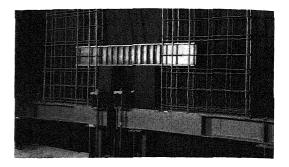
Overall view of reinforcing cage and coupling beam of Specimen 1.
